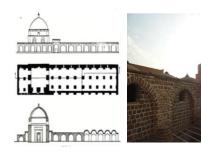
C Plan, section and façade of the Urmiya Mosque,
